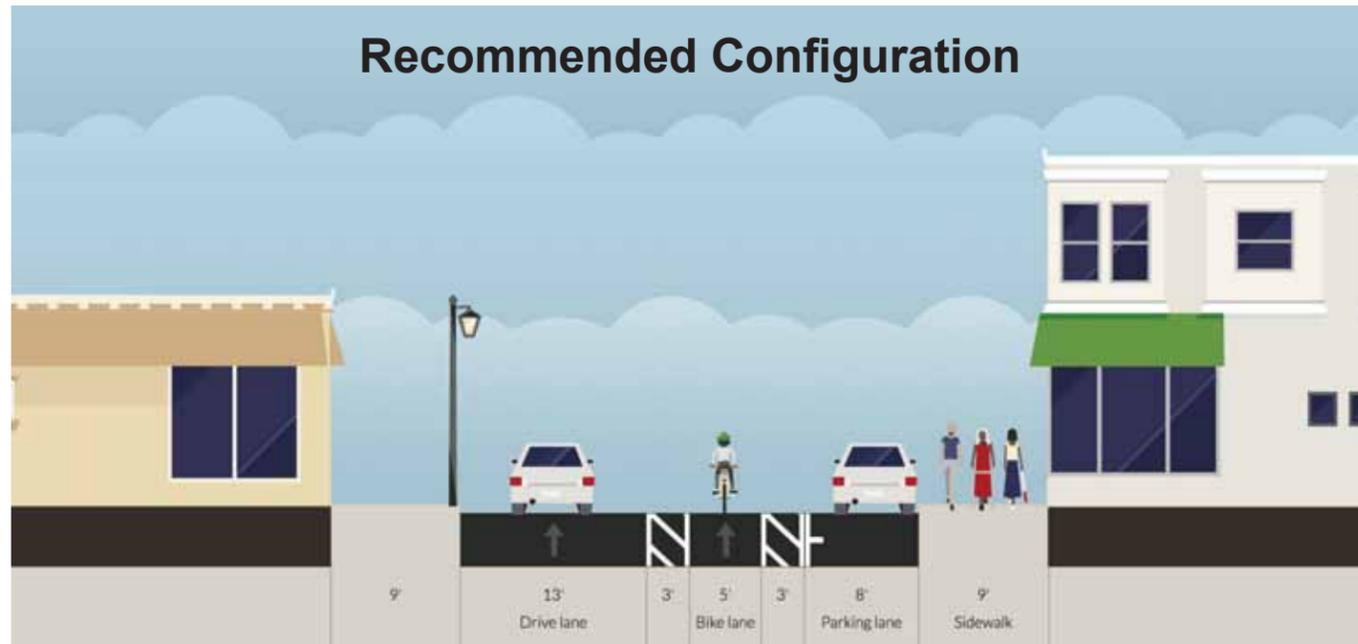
Long-Term Recommendation. One-way Elm Street Near Lancaster Street - North
